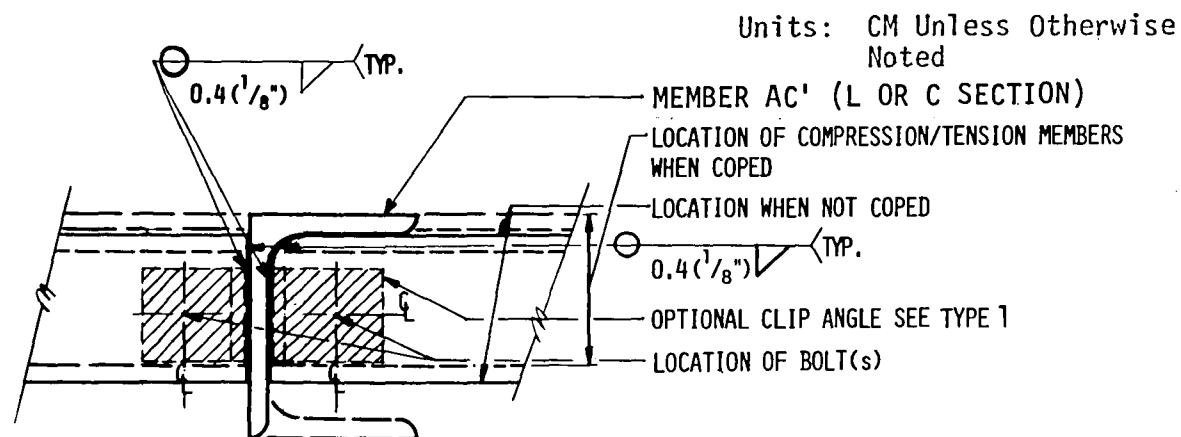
B. Horizontal Bracing Strut Connection Detail Type 2 For Two-Tier Single Span Structures
